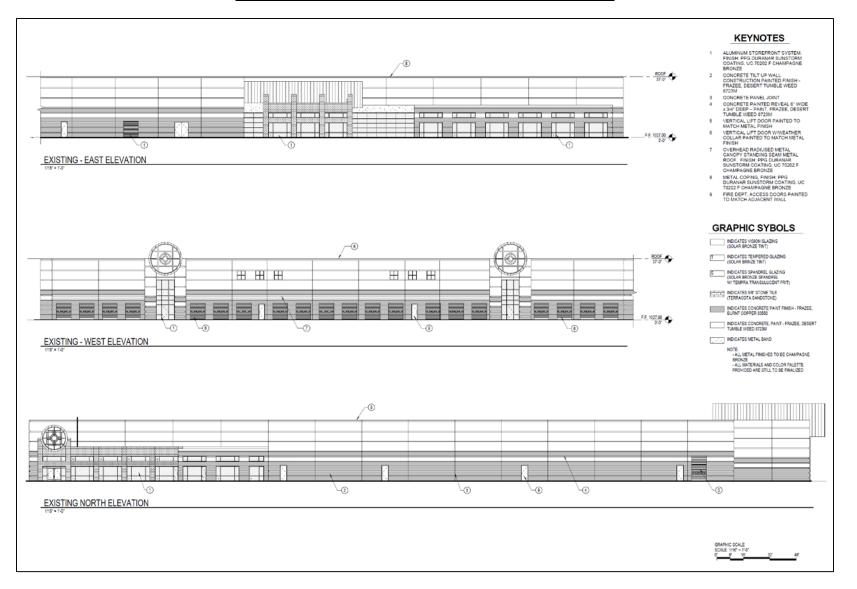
EXTERIOR ELEVATIONS—EXISTING BUILDING
